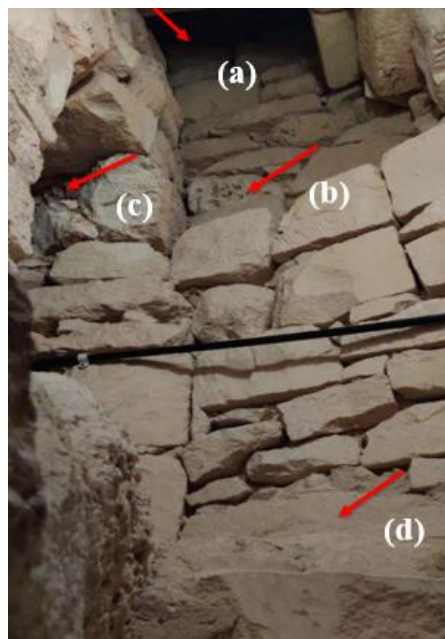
(a) Trap door to enter the hidden passageways from the roof of the Chapel of San Girgor; (b) ledge just below trap door; (c) entrance way to Passageway 1; (d) steps. Photograph by author, October 2020.
